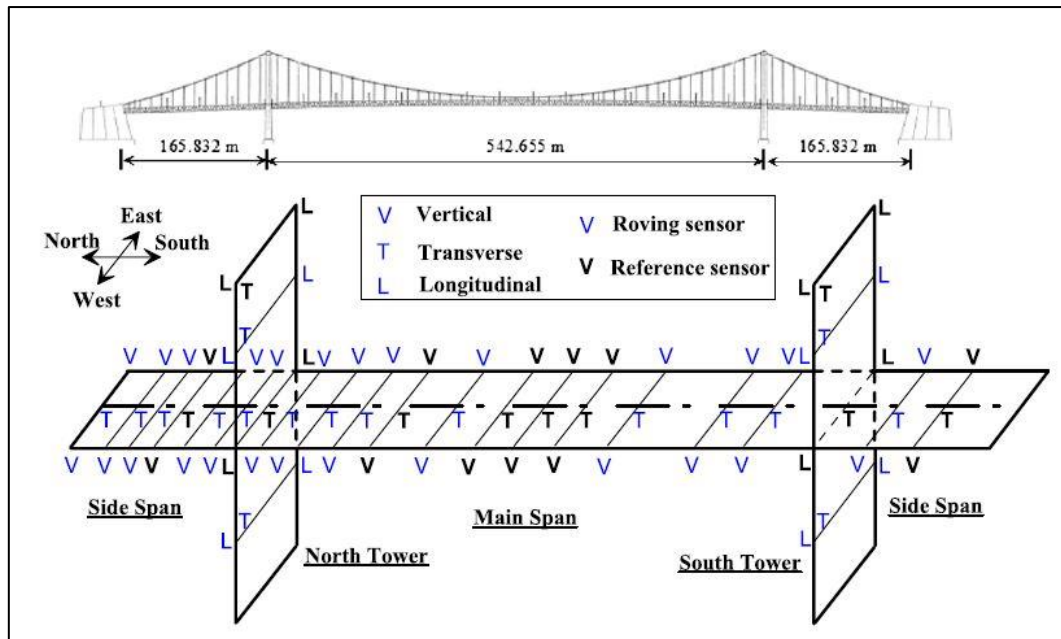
Accelerometer layout for stiffening trusses and tower [J. Zhang et al. 2013].
